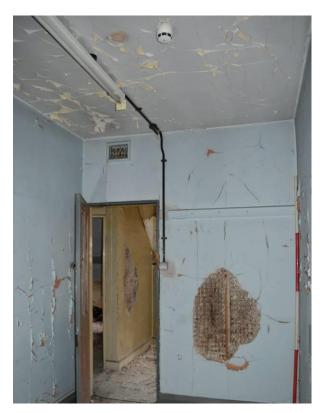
View within room S12, note the mesh construction behind the plaster. Scale 2m. Facing north west.
